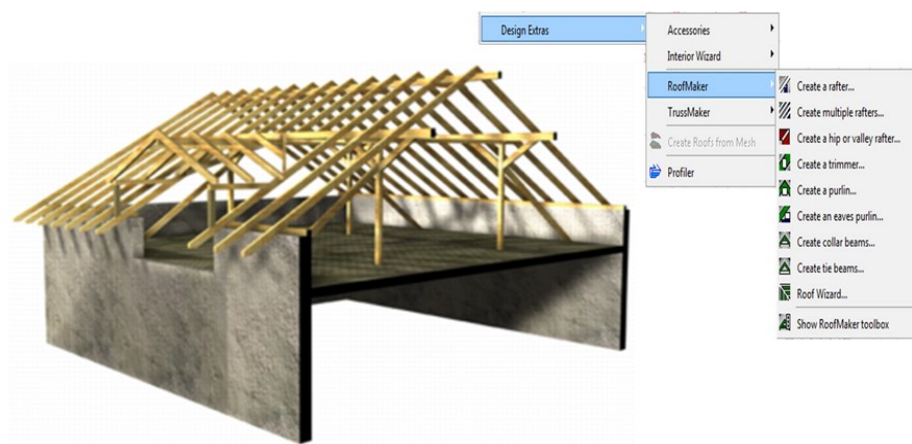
Example of roof design develop using the roof maker add on in ArchiCad
